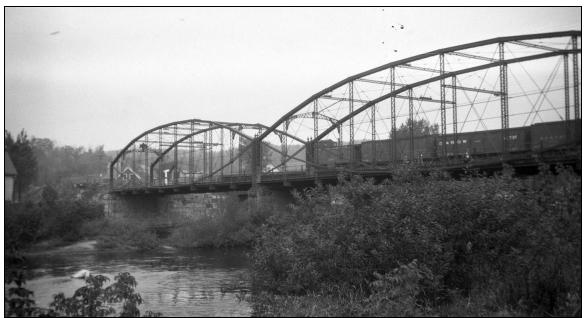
North Stratford Lenticular Truss Bridge, built 1893. Photo dated October 3, 1922, showing upstream side from Vermont shore (Storrs).
